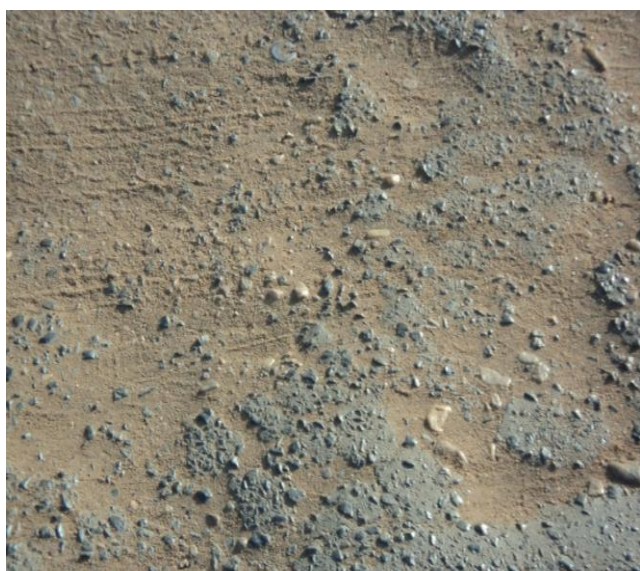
Severe distresses of potholes and heave exist on Alarda Road surface
